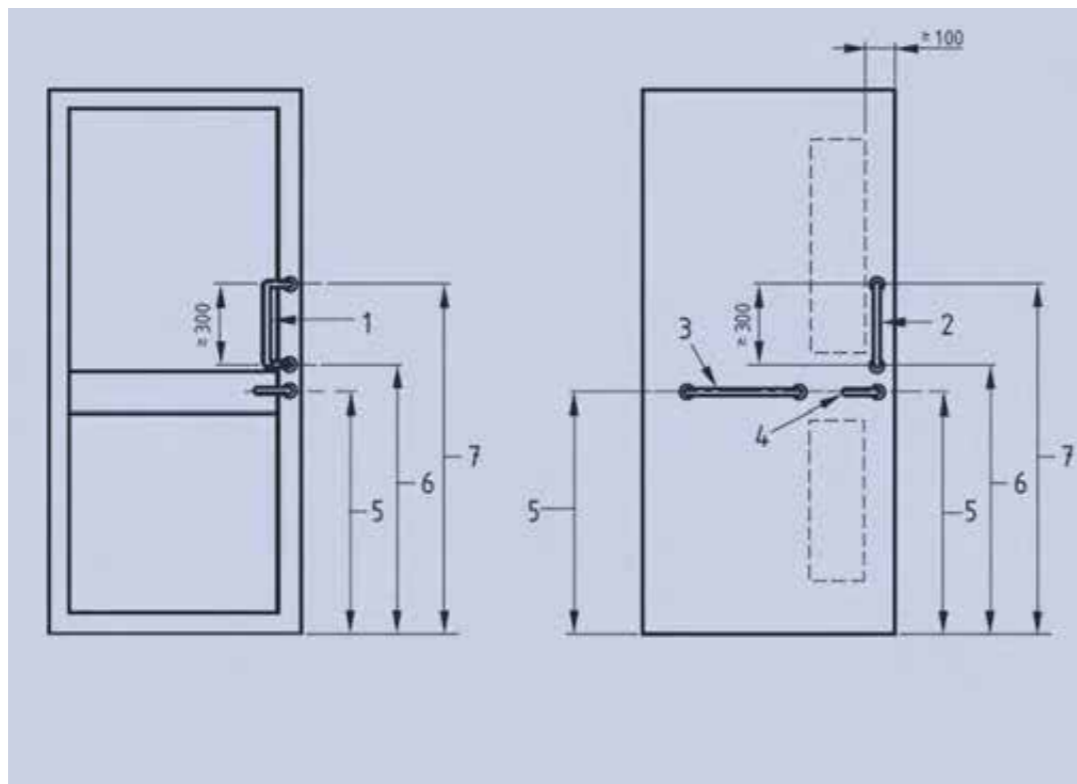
Location of door opening and closing furniture identifies the key dimensions and positions.
